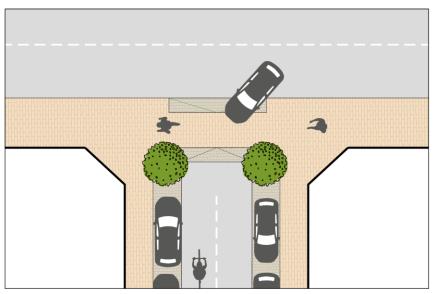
Indicative layout showing the integration of a Copenhagen crossing at a street junction (Credit: Create Streets)
